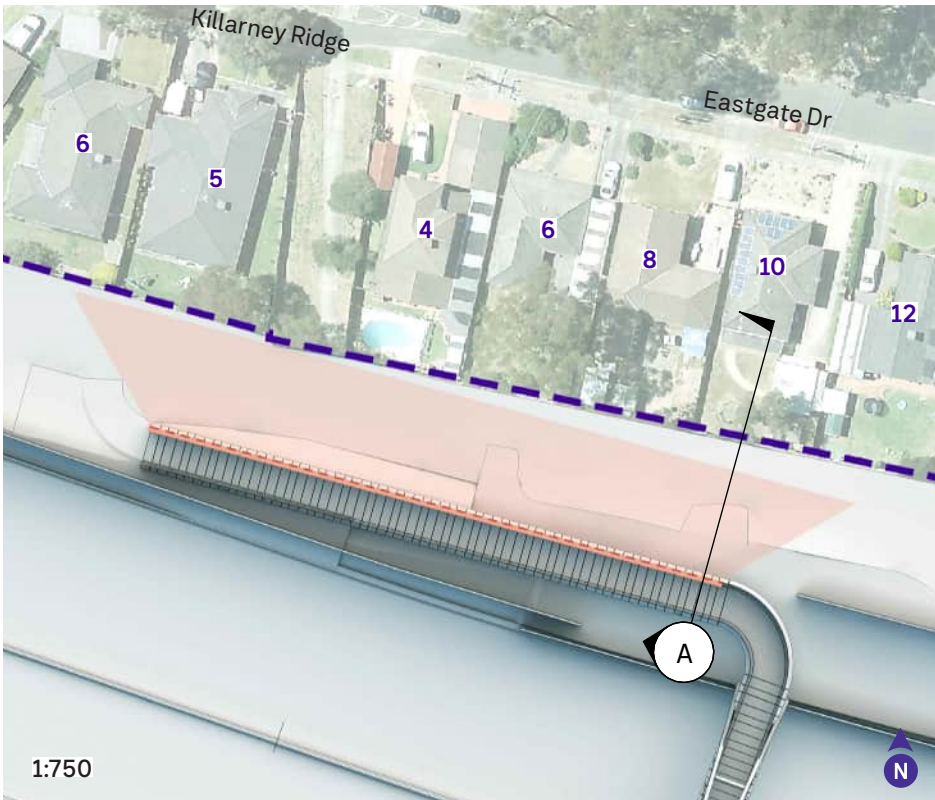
Focus Analysis: Macorna Street Shared Use Path Bridge - Northern Ramp Overlooking Analysis Plan
